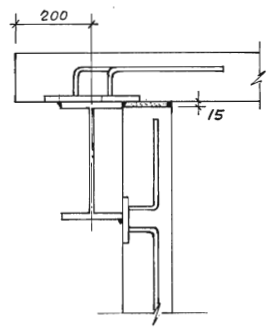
DETAIL OF JOINT IN PRECAST PANELS (Joints in panels at Oil & Dangerous Goods Stores) to be filled with Drypack Mortar scale: full size
